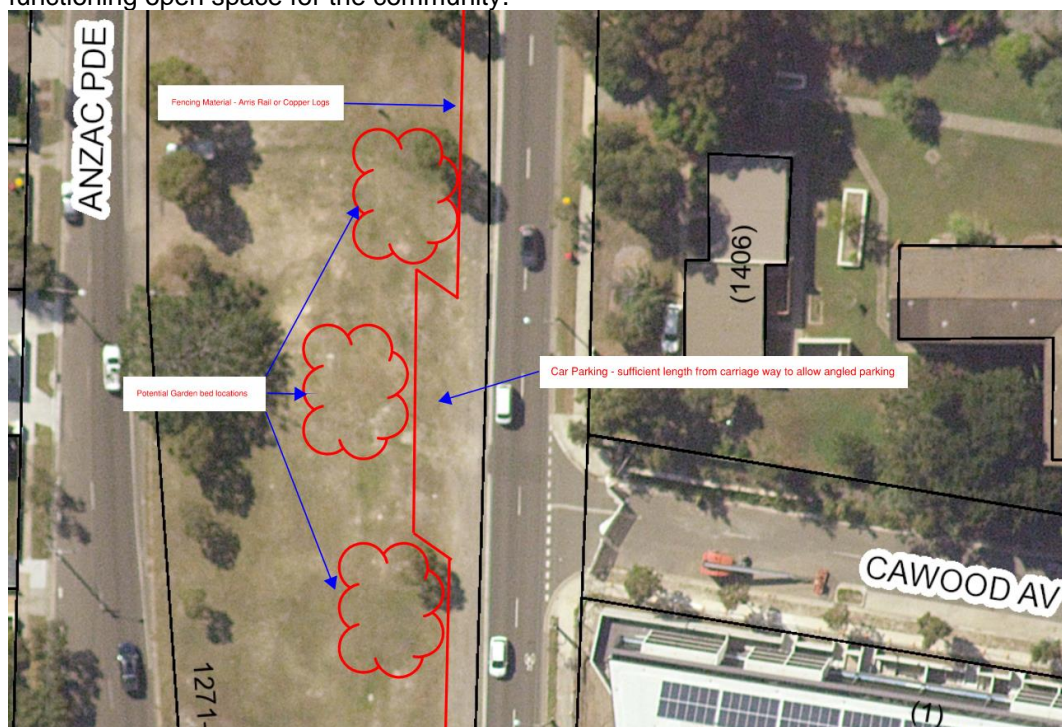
Proposed angled parking configuration with potential garden bed locations.
